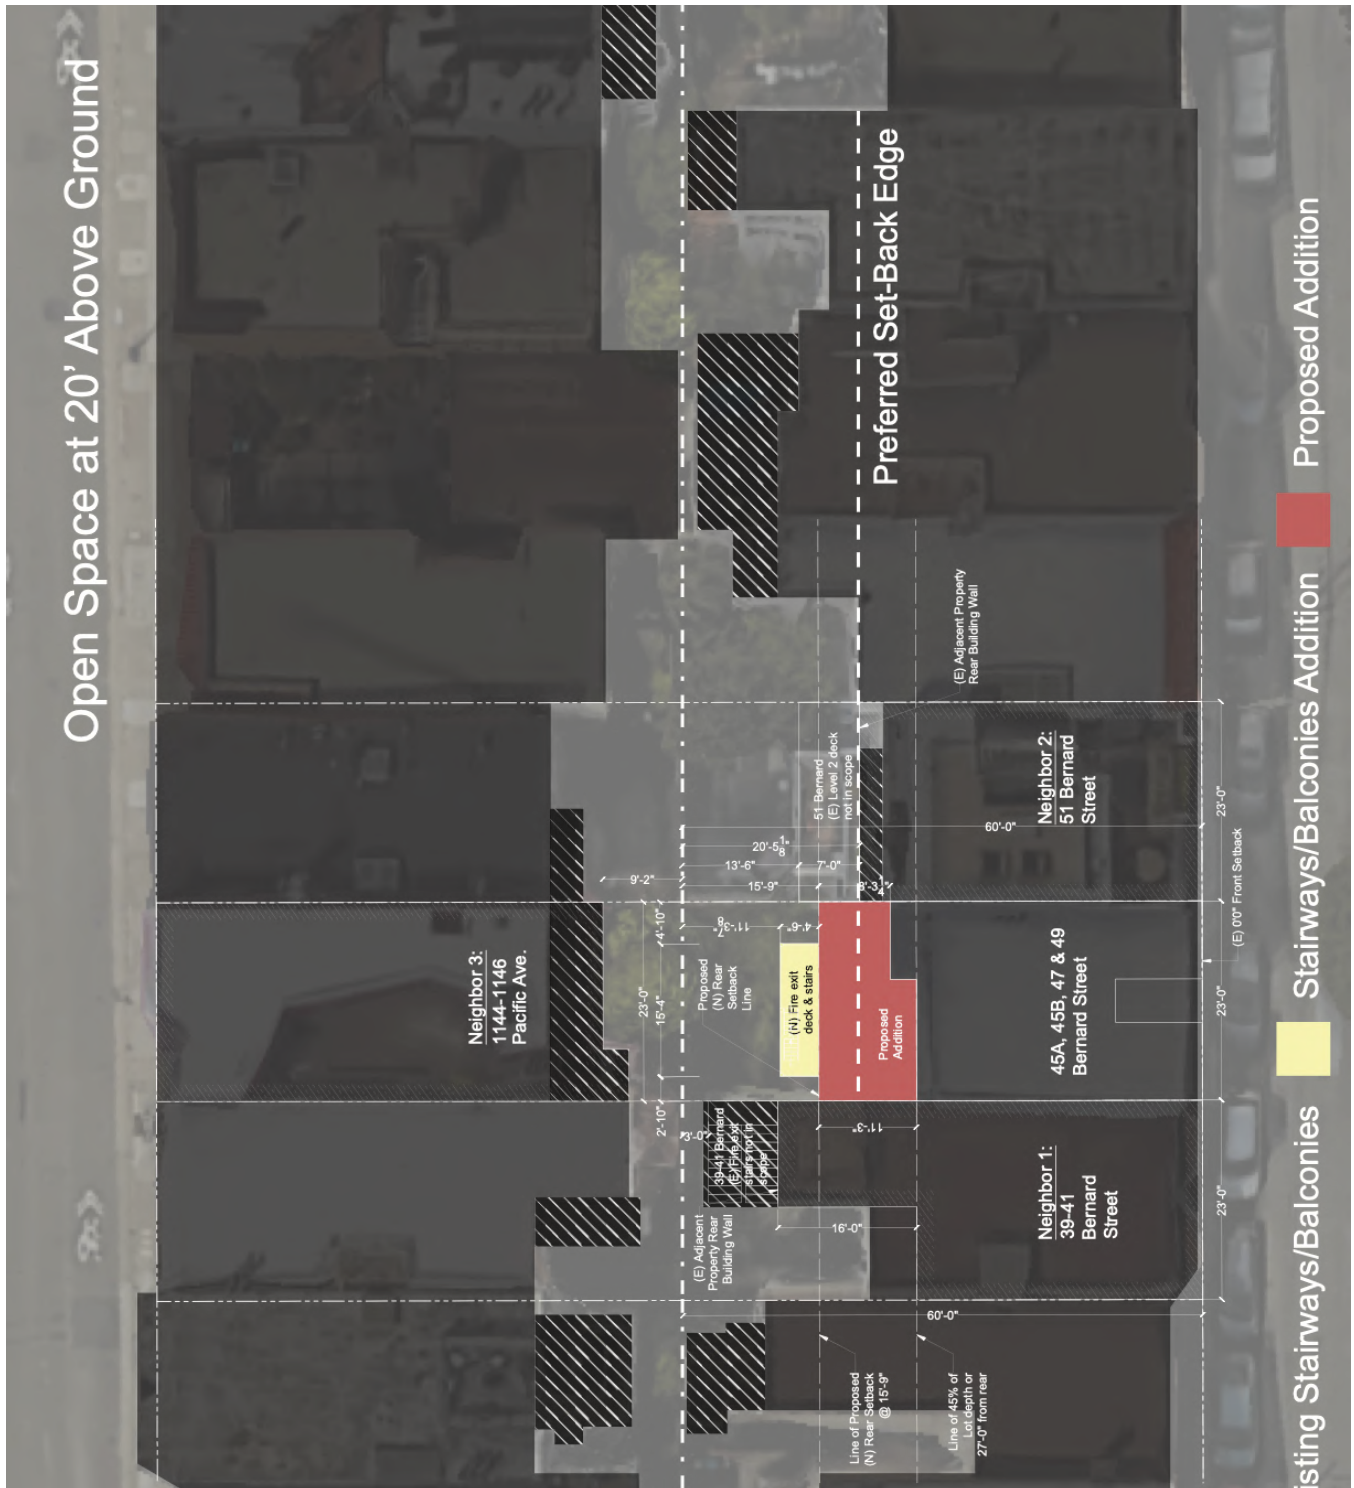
Site view of the existing open space, with the proposed addition (in red) and the proposed decks and stairs (in yellow). We wish to note that the illustration does not include all the existing egresses and walkways of the other buildings on our block. The Google Maps image that we used to develop this illustration did not have sufficient details for us to show accurately all the structures and dimensions.
